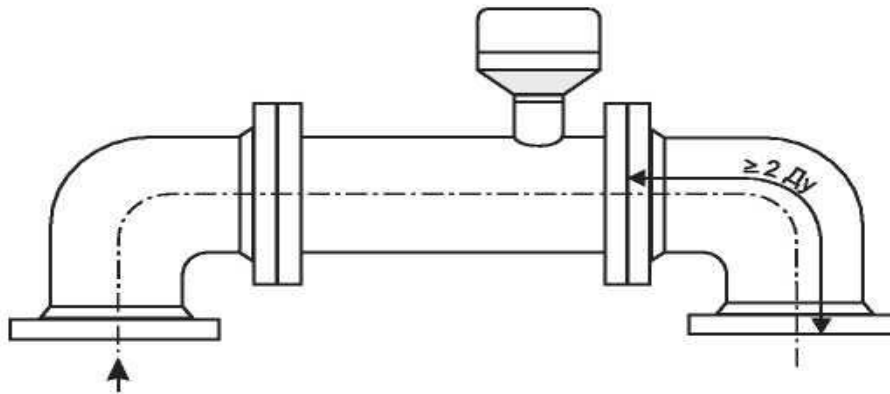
Schematic illustration of TRZ 03-L installation on the pipe
